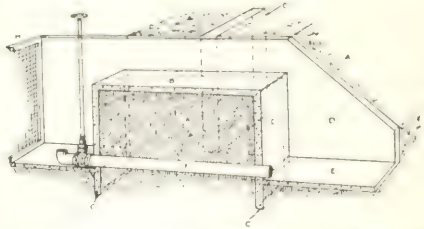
Outlet for pond. A, dike; B, overflow; C, cores; D, concrete walls; E, apron; F, drainpipe; G, gate valve; H, screen
